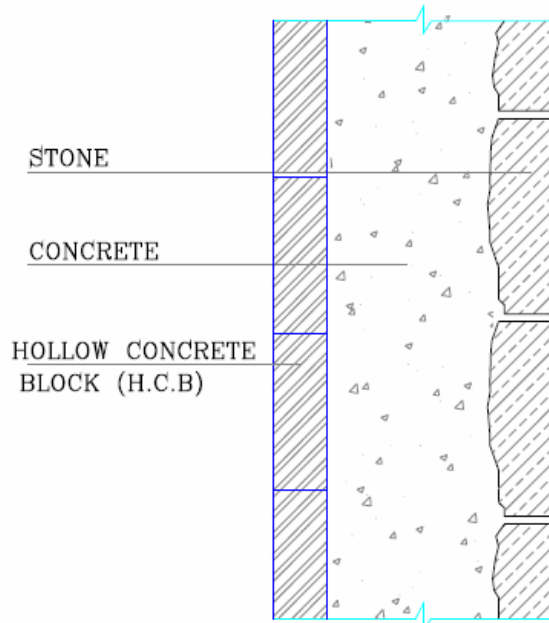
An example of the traditional construction materials used for the exterior walls in WB. Source: (ECB Studies, 2002, B).
